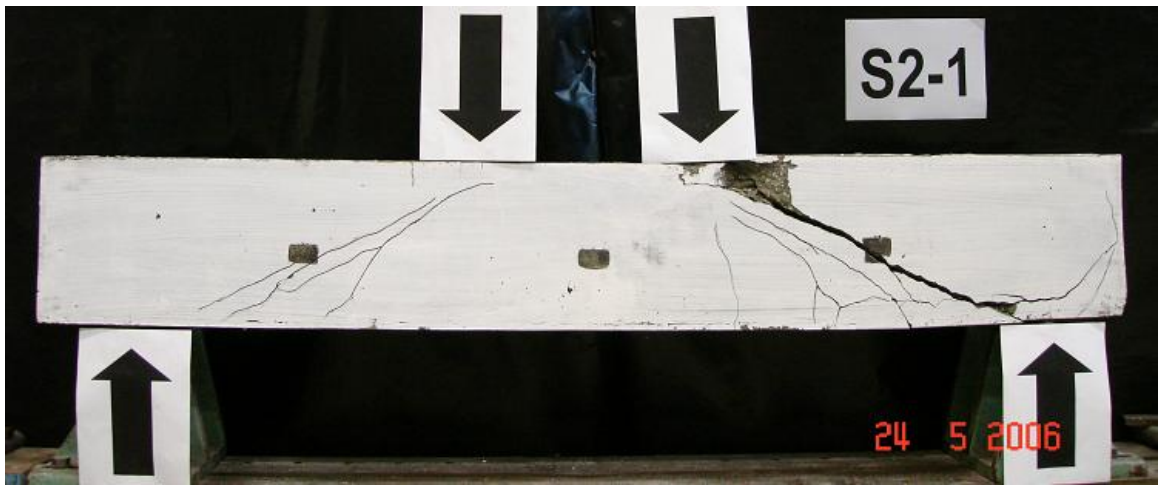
Overall Crack Pattern for Beam S2-1 (Front Face)
